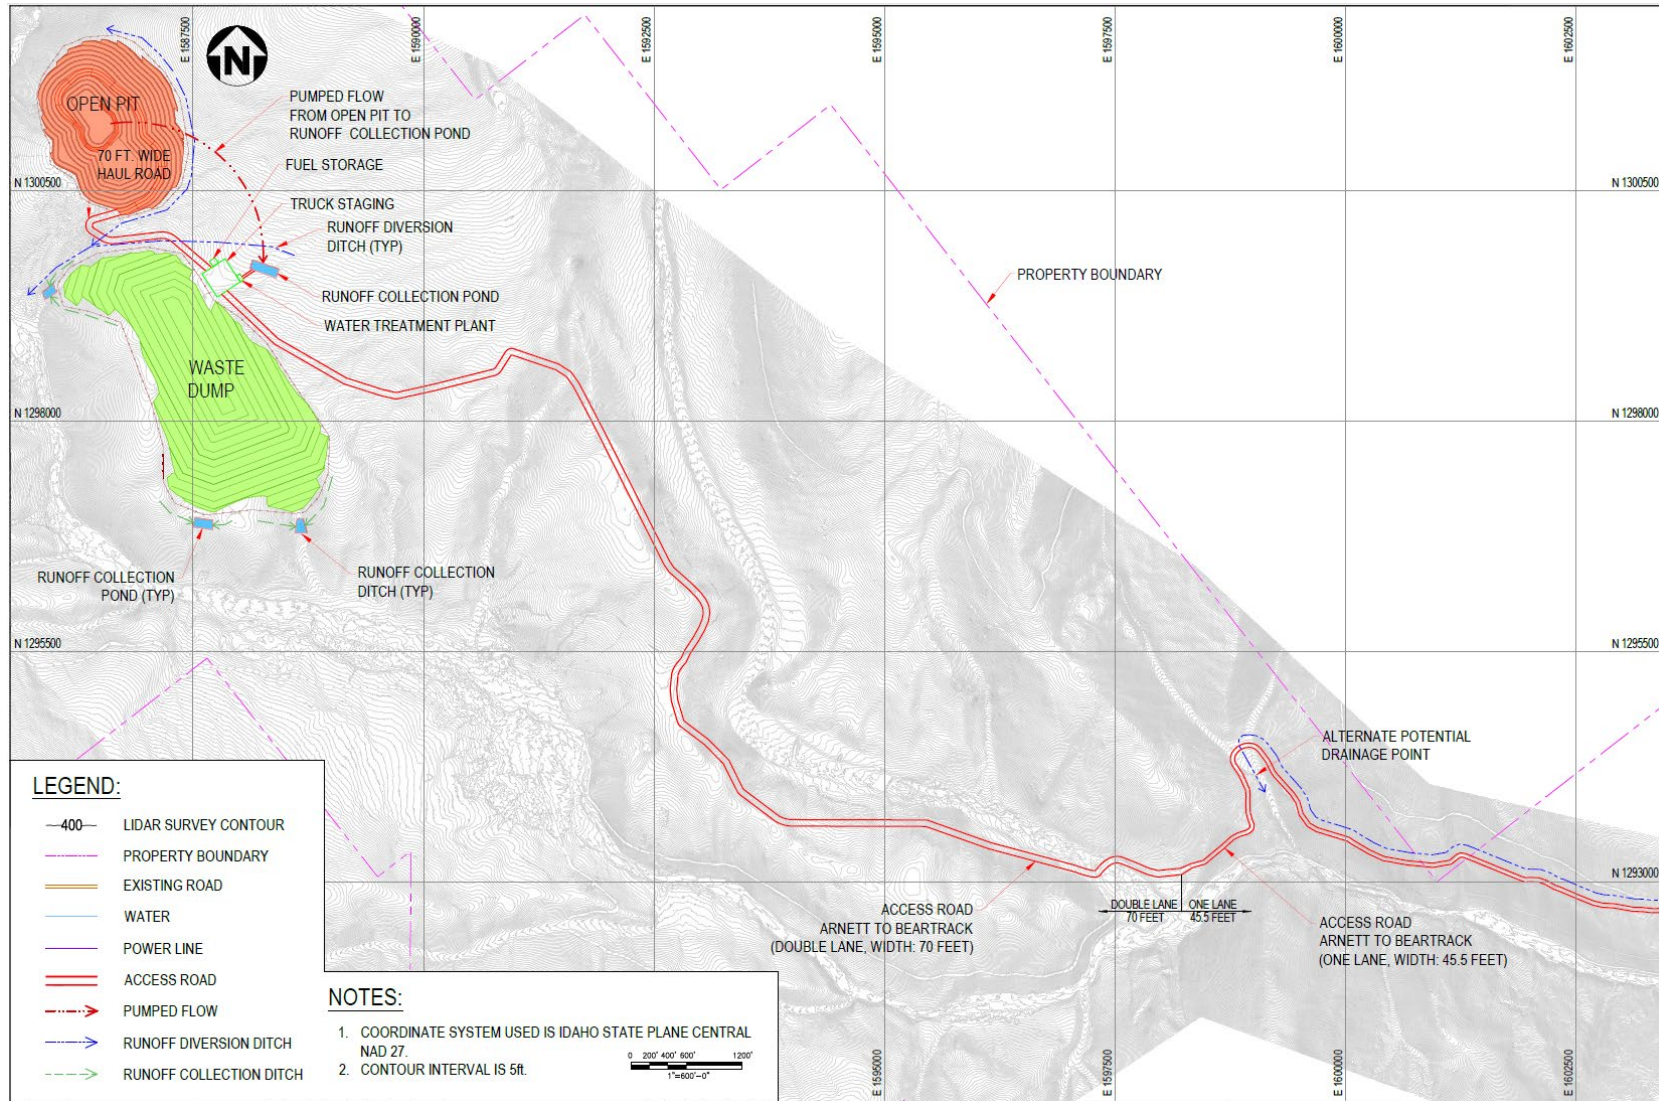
Overall Site Layout Plan (Source: Wood, 2020)
